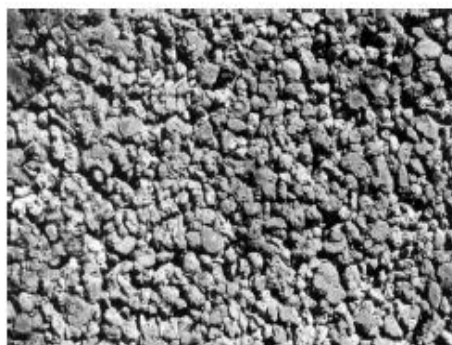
Pervious concrete pavement texture on parking lot.
